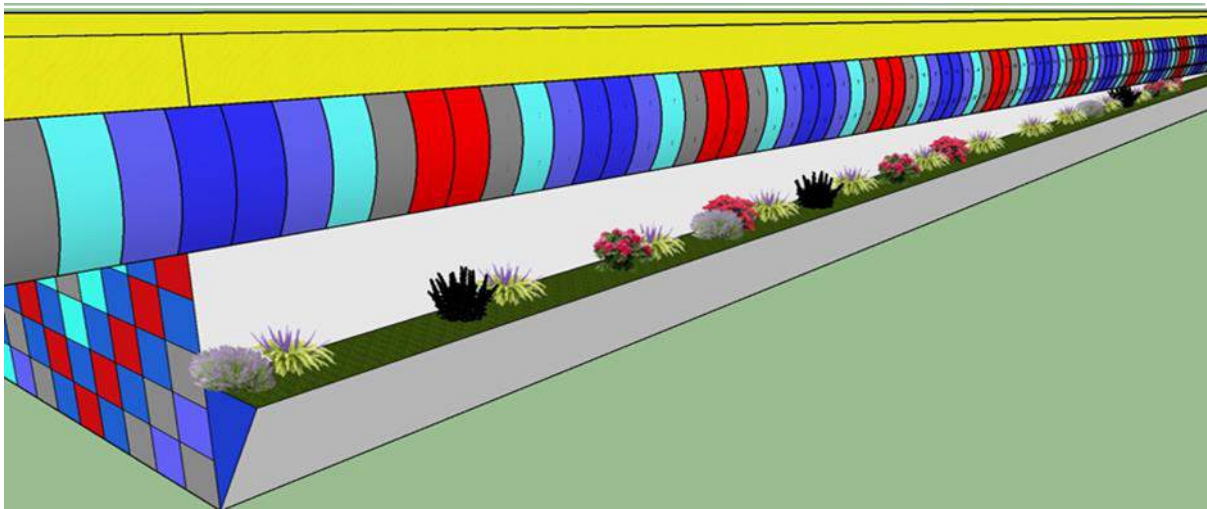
Retaining wall concept design #2 (DPC Urban Planning 2017)
